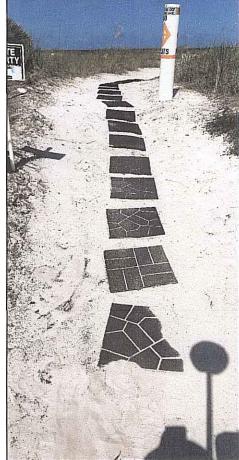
HEX BLOCK WALK (SEE SHEET 2 OF 7)
